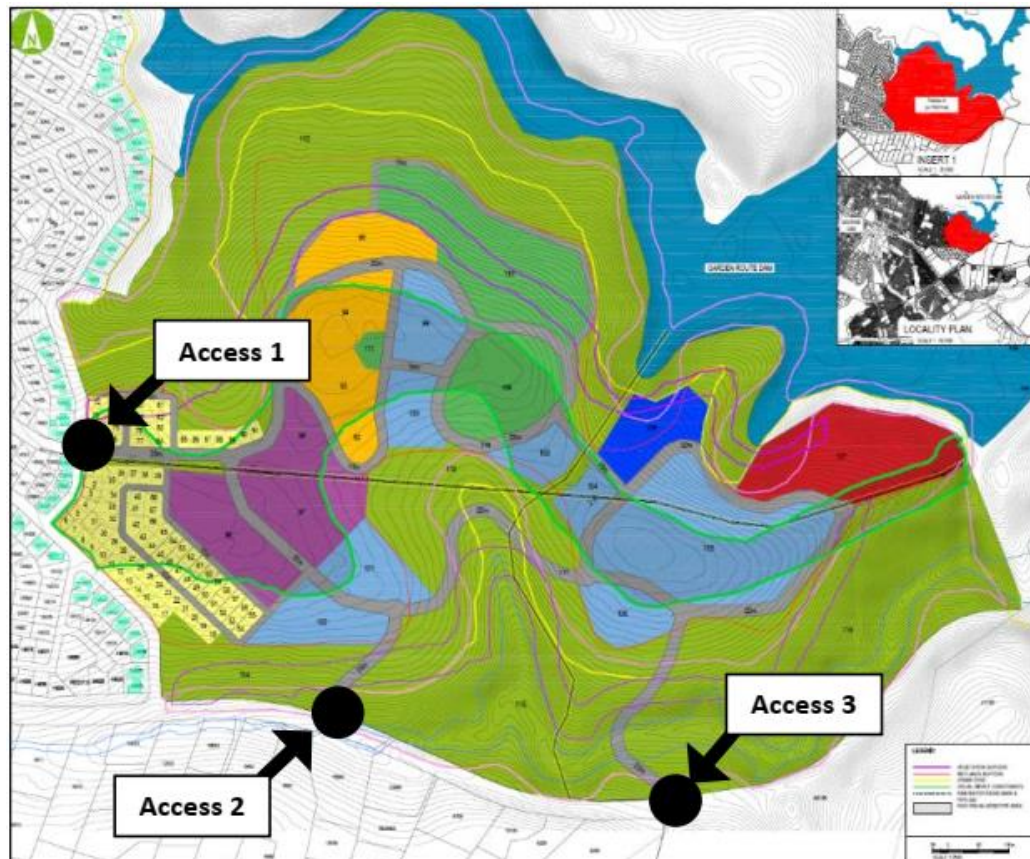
Proposed Site Accesses (Source: Aurecon 2019)
